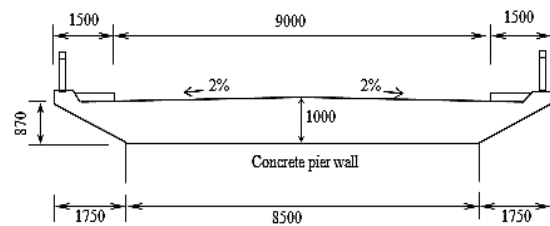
Cross Section at Solid Part of the Deck Slab.
